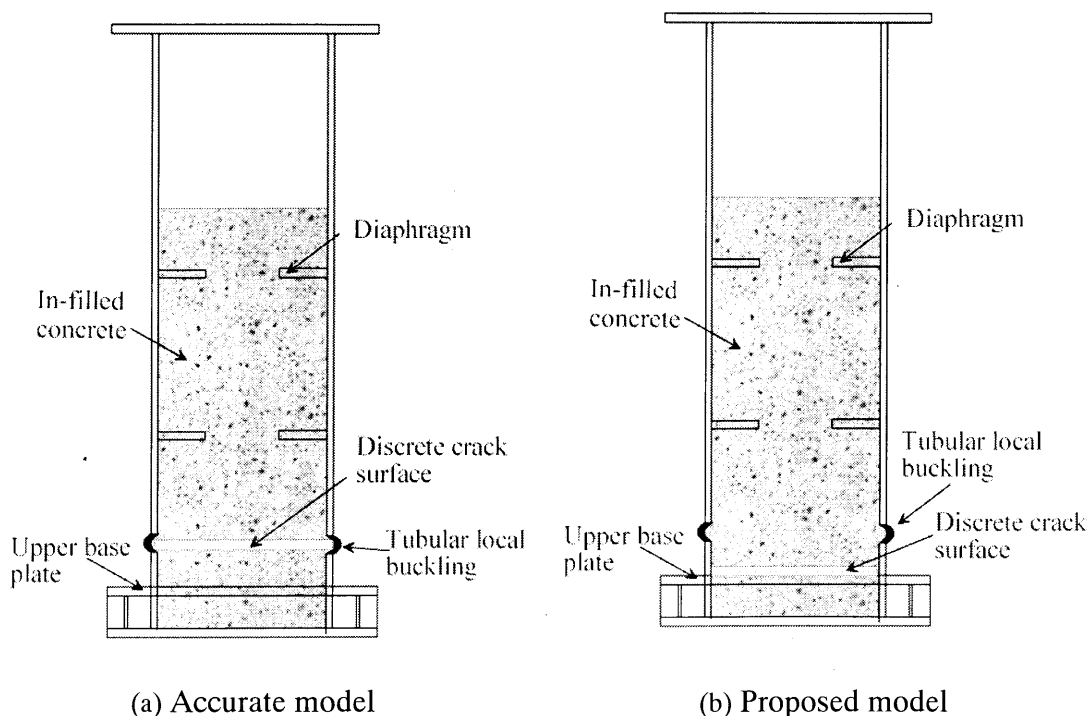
Location of discrete crack surface in in-filled concrete
